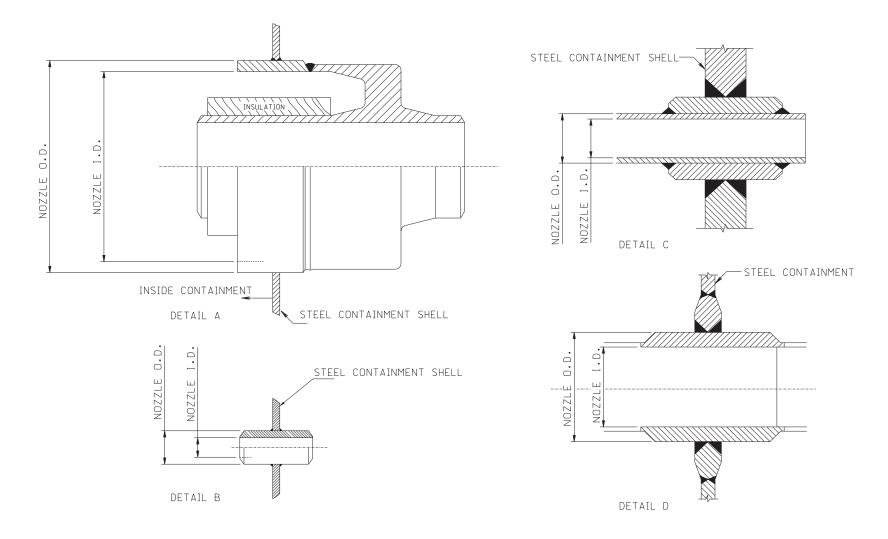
(Sheet 4 of 8) Containment Penetrations
